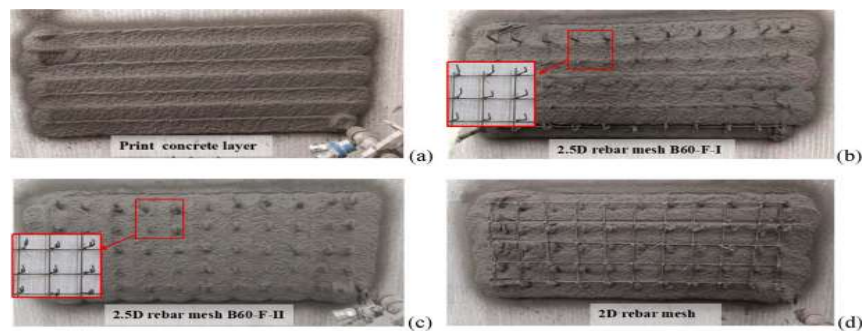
Process of printed concrete slabs with different types of hooks. [6]
